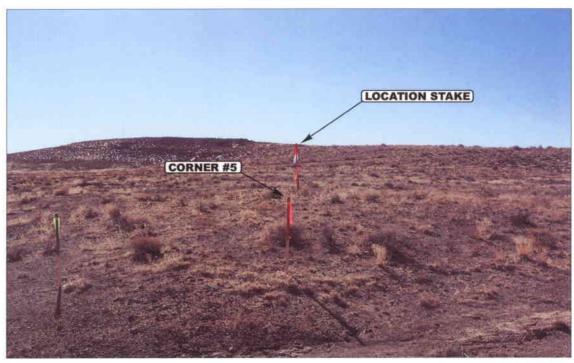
PHOTO: VIEW FROM CORNER #5 TO LOCATION STAKE
